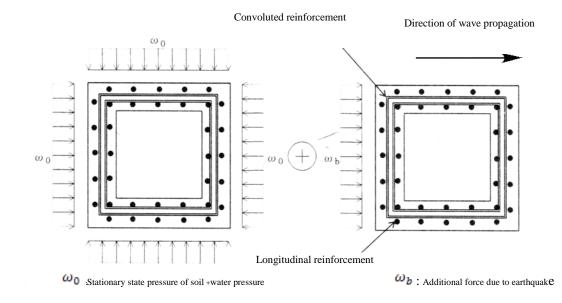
Loading and arraying rebars (insitu rectangular manhole)
